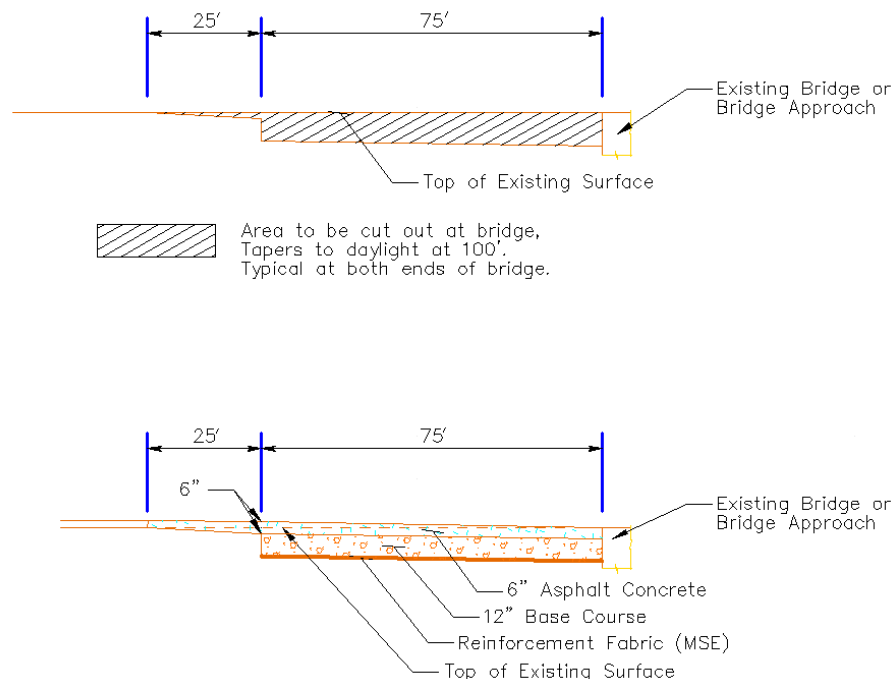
Bridge approach pavement replacement design in South Dakota
